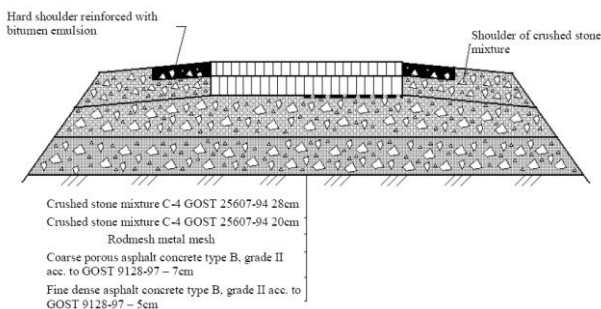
Road pavement structure of Chita-Khabarovsk autoroad experimental section
